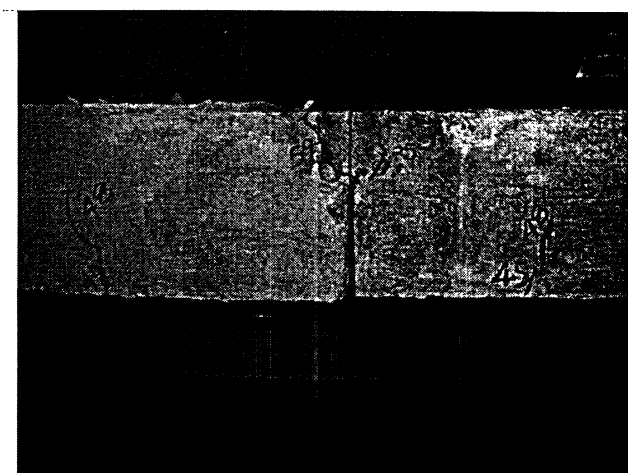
Crack Pattern at the Bottom of Model M4 After Testing
